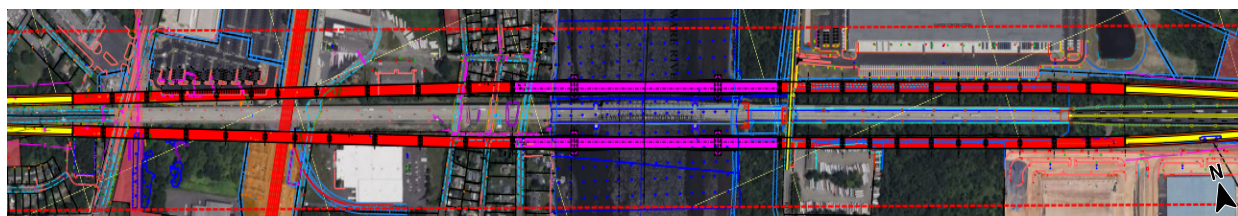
Alternative DNI: Dual No Impact to existing approach spans
